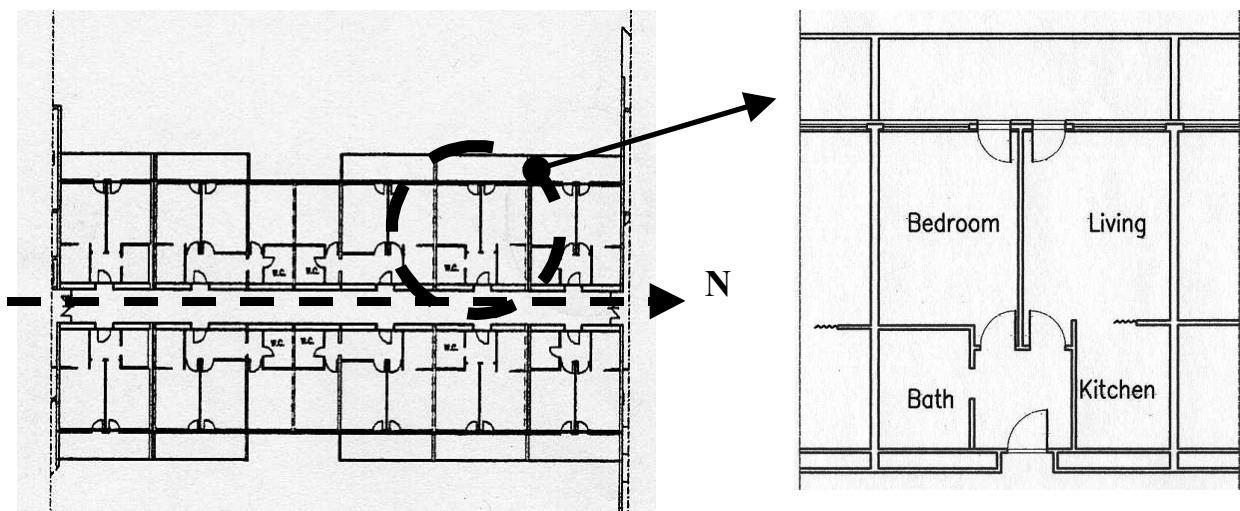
Extract from building plan and particular of the 2 rooms apartment monitored.
